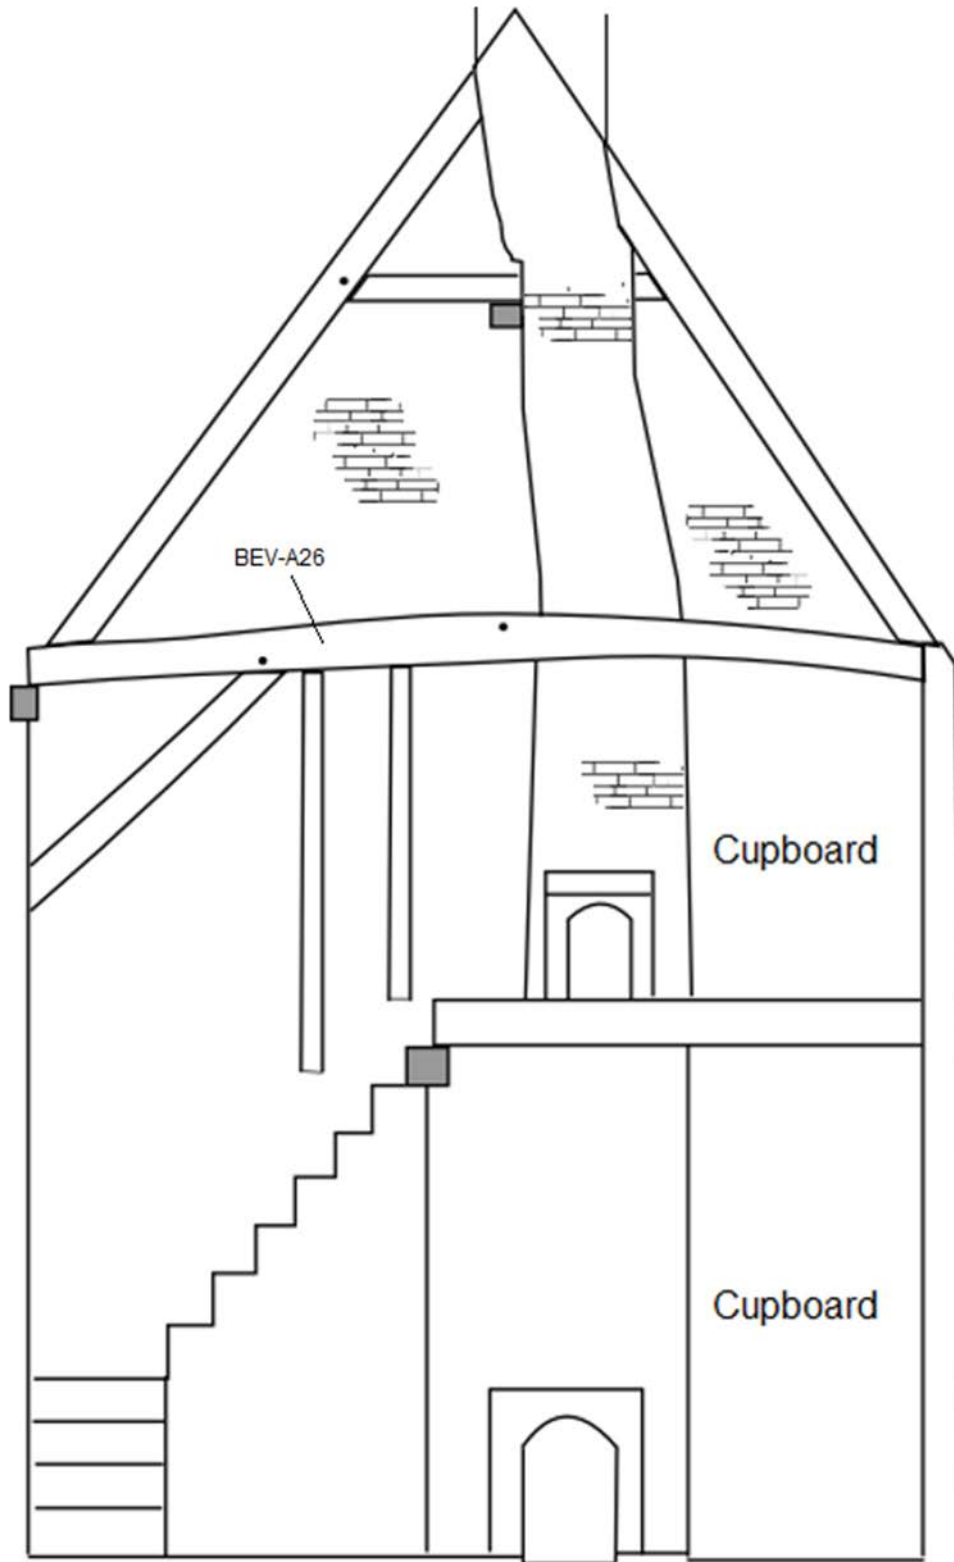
Truss 1 (from south), showing the location of sample BEV-A26 (YVBSG 2016)
